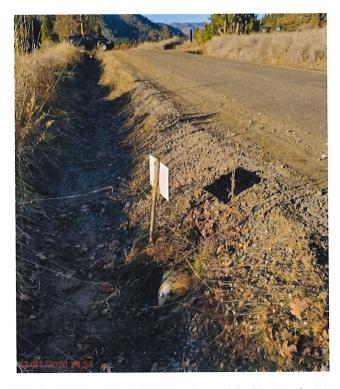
10" diameter PVC piped ditch section (~300ft) under road, looking North. Water can be diverted from roadside ditch into pipe or can continue North down roadside ditch to irrigate other fields. Pipe is cleared out each season and white end cap is removed. Road was recently re-graded by county and they partially buried the pipe.
